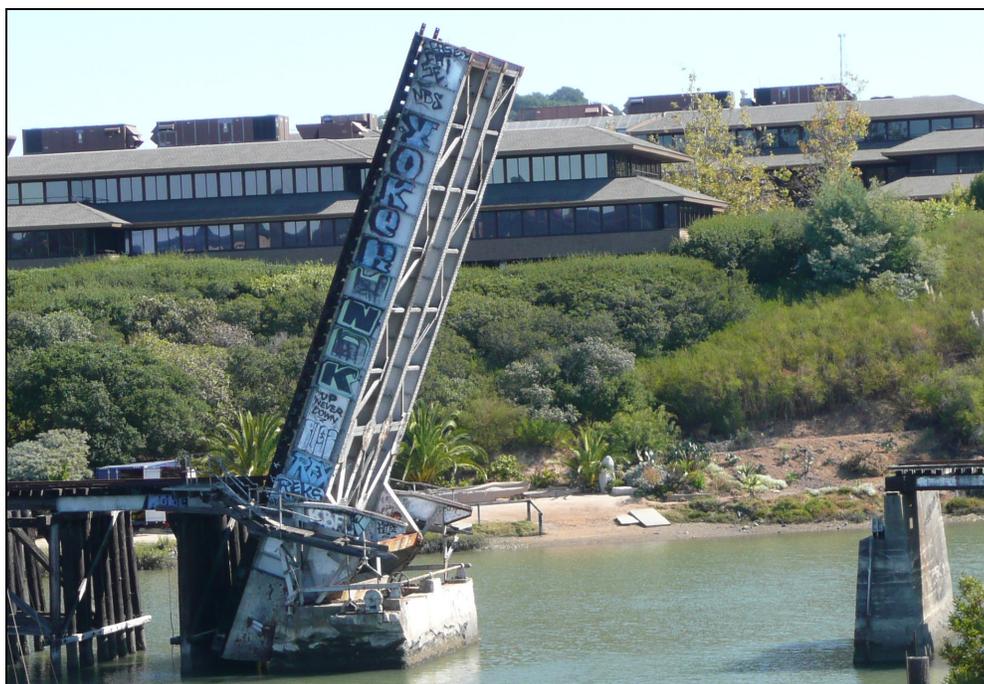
View of trestle showing bascule bridge in background, camera facing south.
